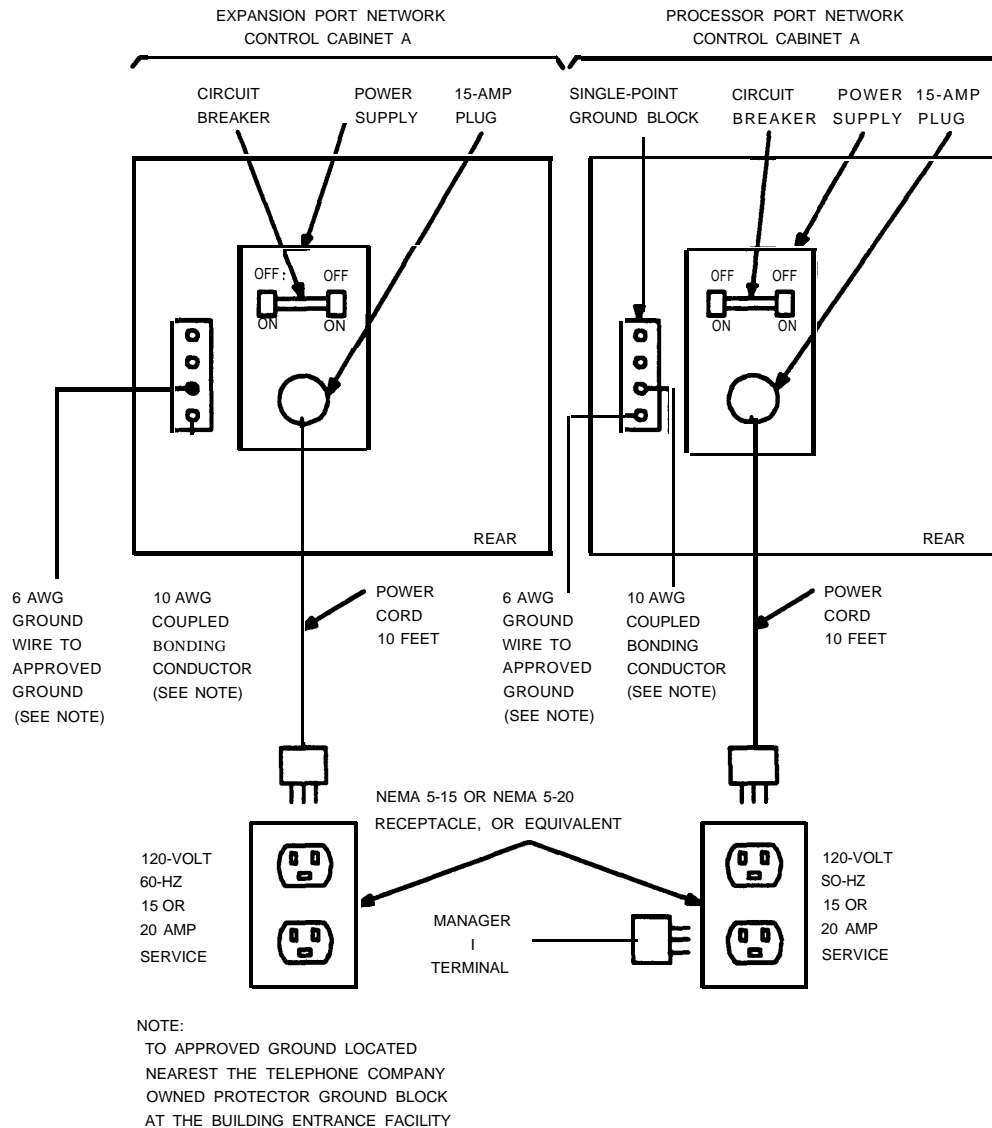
Typical Single-Carrier AC Power and Grounding Layout (Remotely Located EPN)
